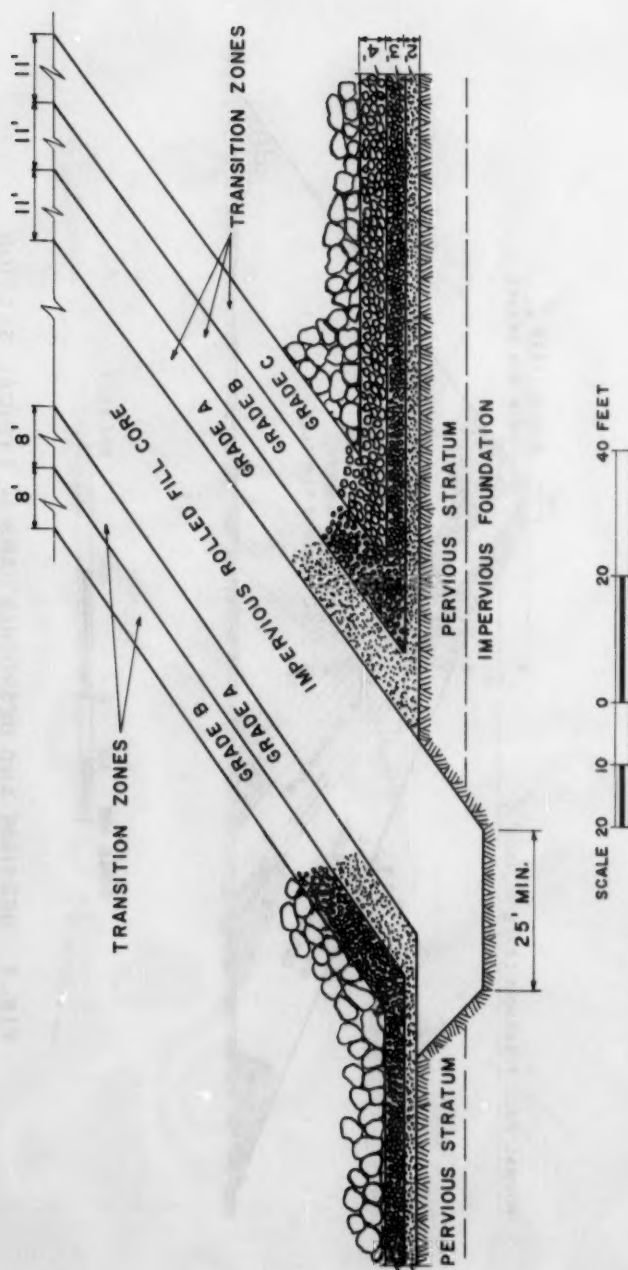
BERSIMIS DAM - PARTIAL SECTION ON OVERBURDEN
